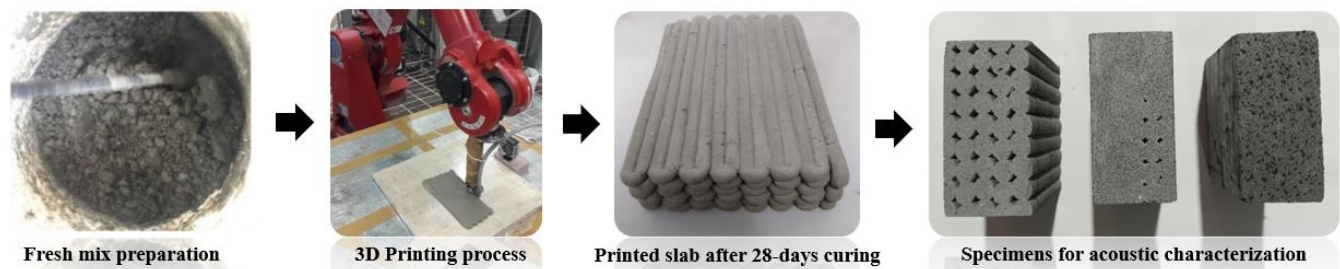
Stages of specimens manufacturing by extrusion-based 3D printing
